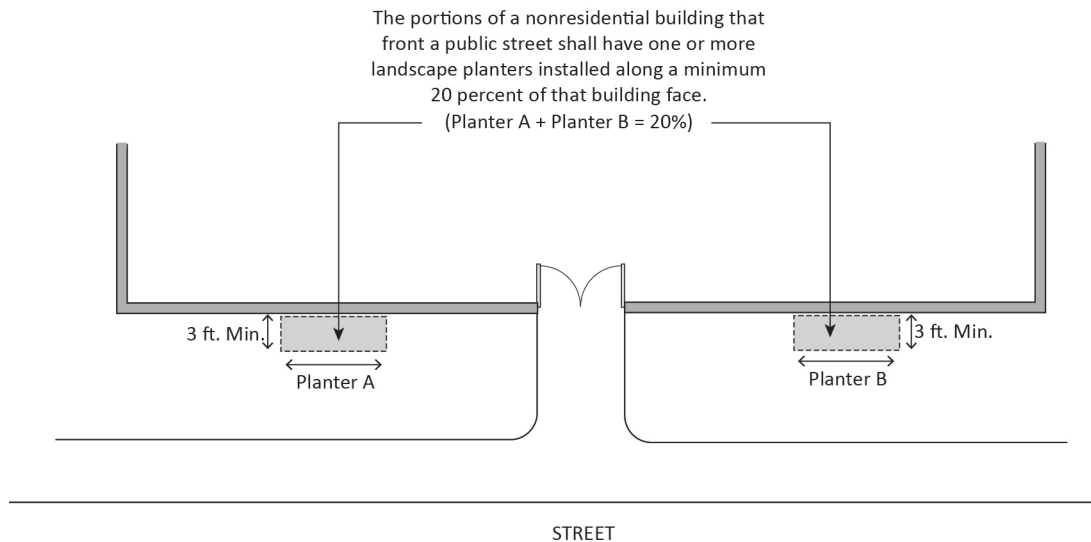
D: AREAS TO BE LANDSCAPED, BUILDING PERIMETERS
